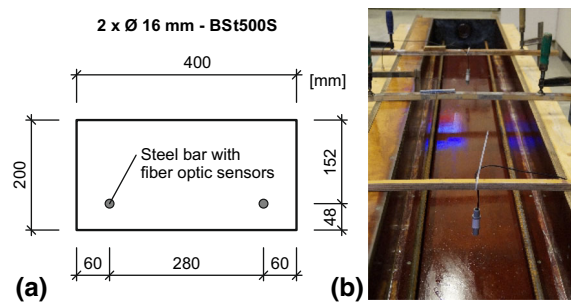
Bending beam: a Position of the steel bars; b Mould before casting of the beam
